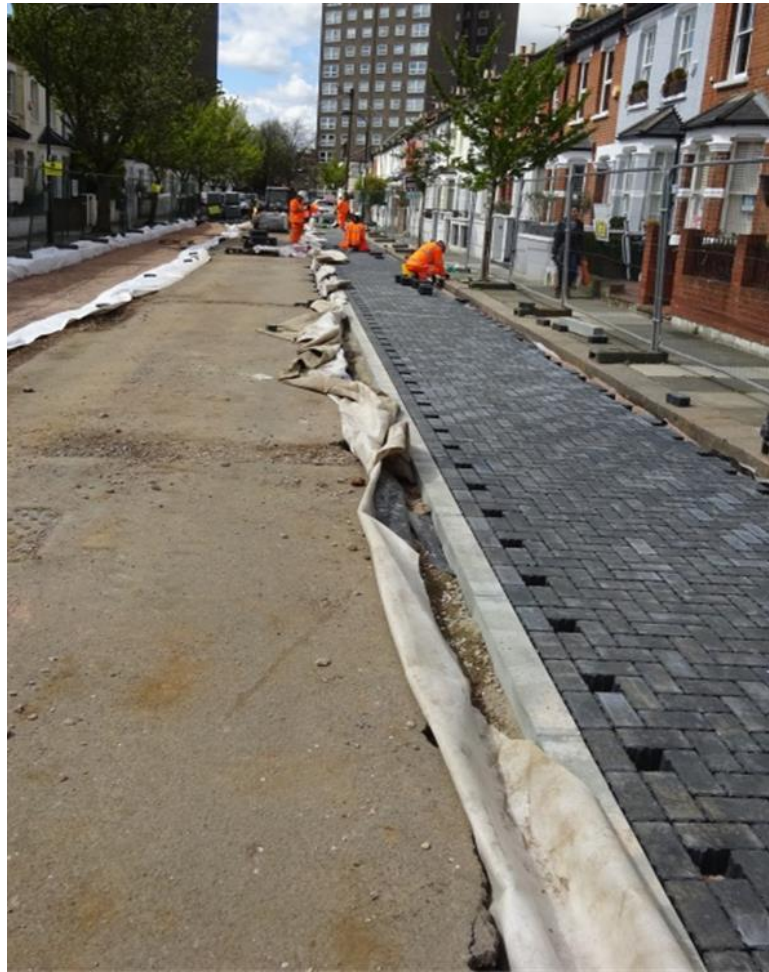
Permeable block paving being installed at Mendora Road, Fulham
